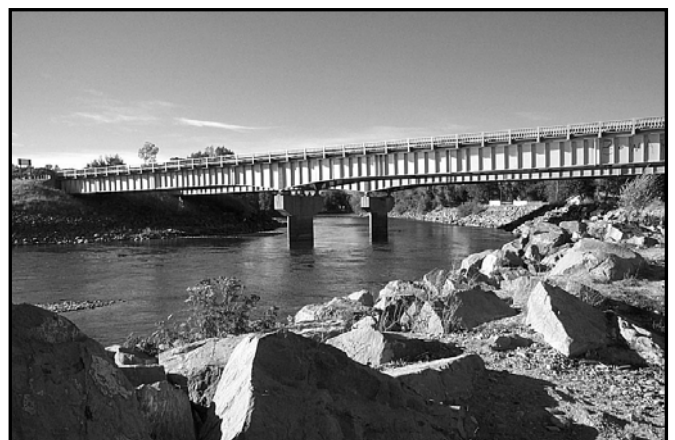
Interstate 90 Bridge. Photo by E. Galli-Noble.
